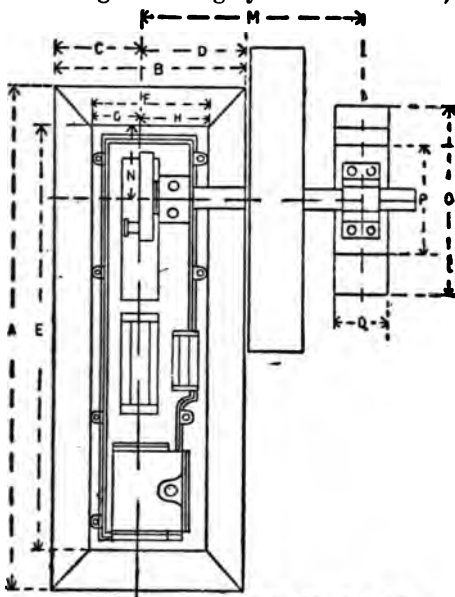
FOUNDATIONS ATLAS ENGINE, PLAN.
